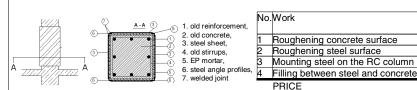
Sidewall on chosen columns (after Bostenaru[])
